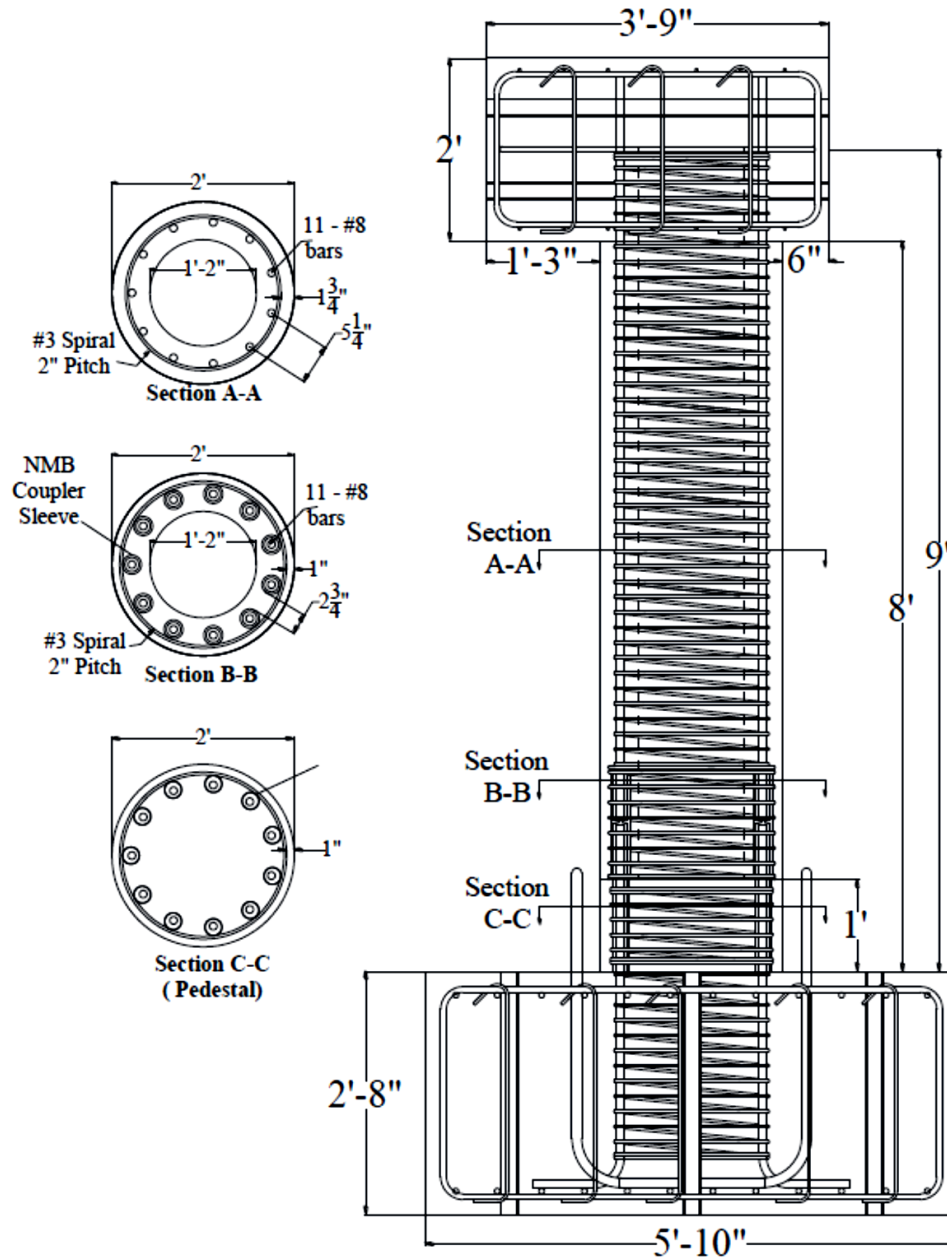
GCPP Column Incorporating Grouted Couplers Tested by Haber et al. (2013)
